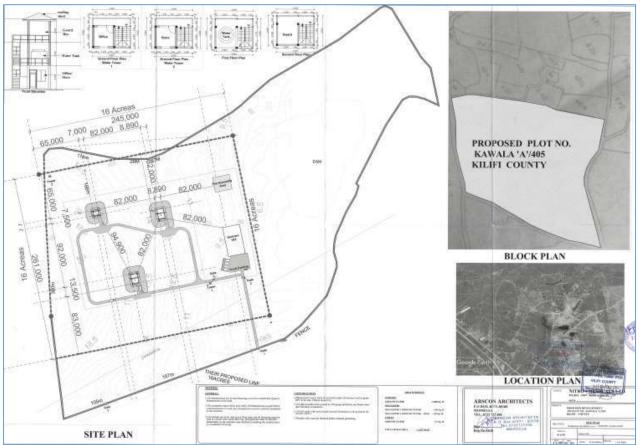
Site layout plan for the proposed project (Source: Arscon Architects, December, 2022)
